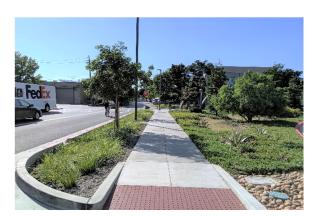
Stormwater planter at Independence Drive, Menlo Park
